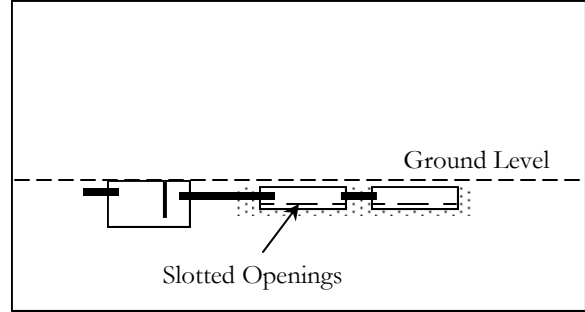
B. (Side View) Septic Tank and Precast Concrete Block-Trench System. Slotted openings along bottom of each side allow for appropriate lateral absorption. Precast blocks provide structural system stability in unstable soils and are more easily repaired/replaced than traditional leaching systems.
